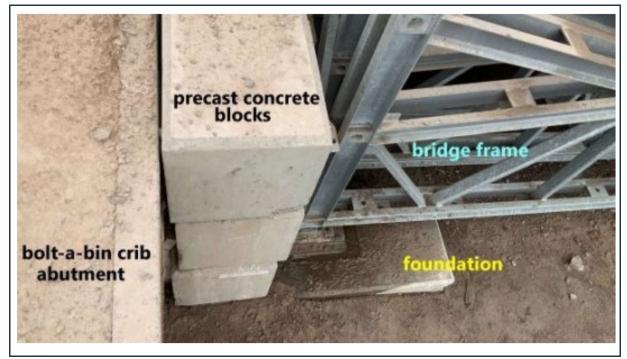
View of the components of the bridge and bridge abutment at KM-17.
